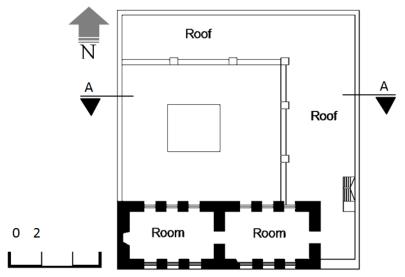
First-floor plan of a traditional building in Bushehr (Memarian, 2006)
